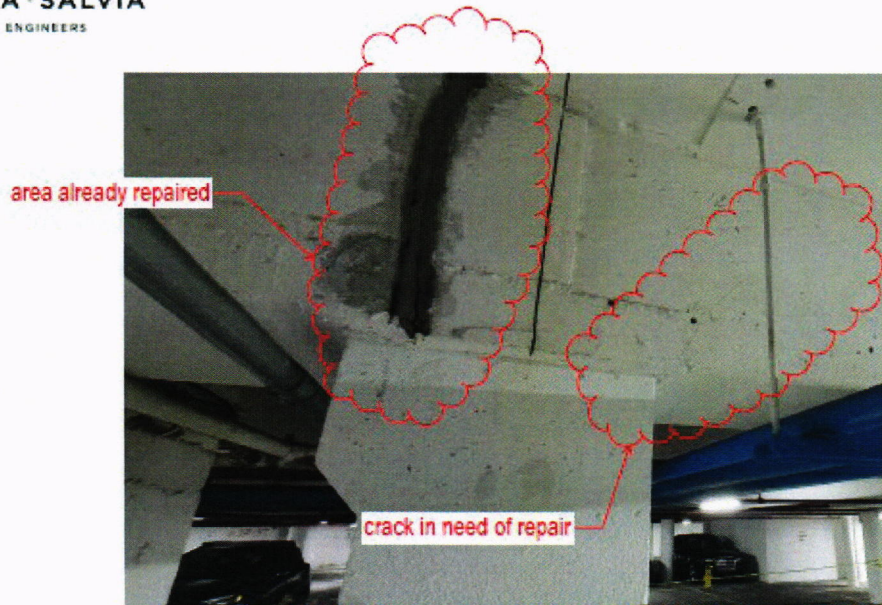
Concrete shear cracking occurs at soffit concrete beam.
